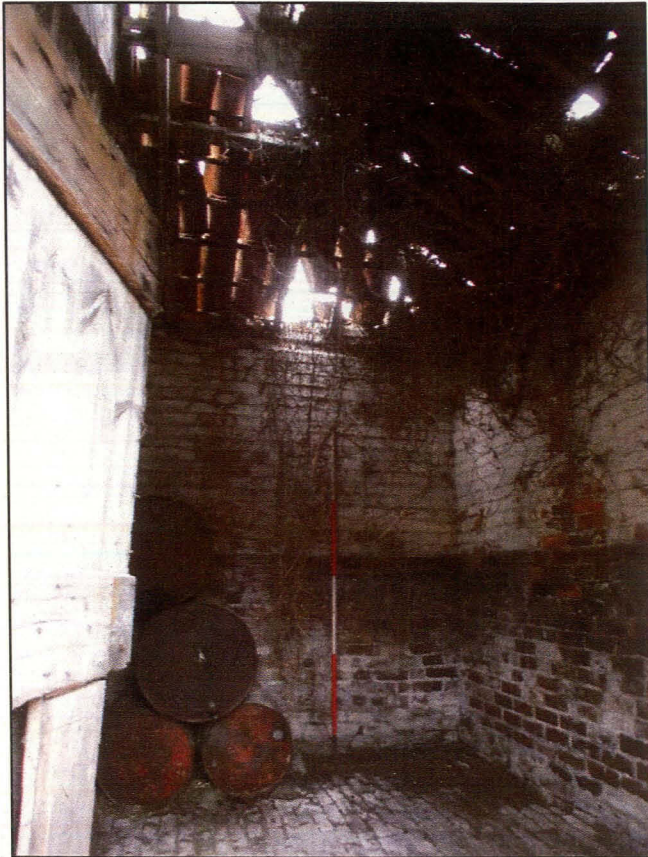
(Shot 77): General view of store B9 showing intruding vegetation from the roof. Looking east-south-east
